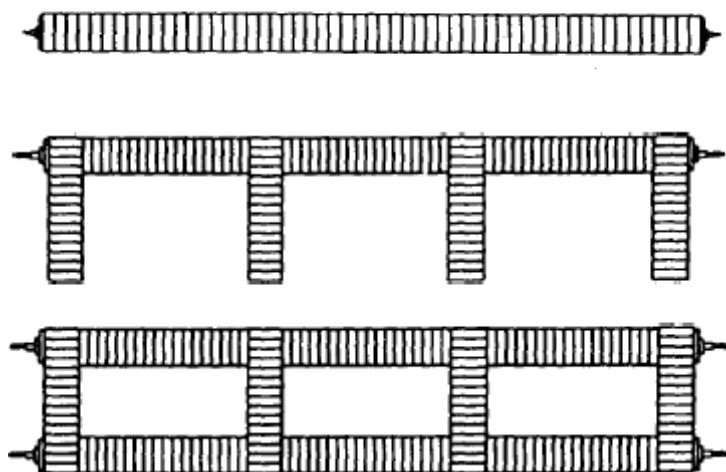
Typical cross-sections of stress-laminated bridges. [Ritter et al. (1994)]
